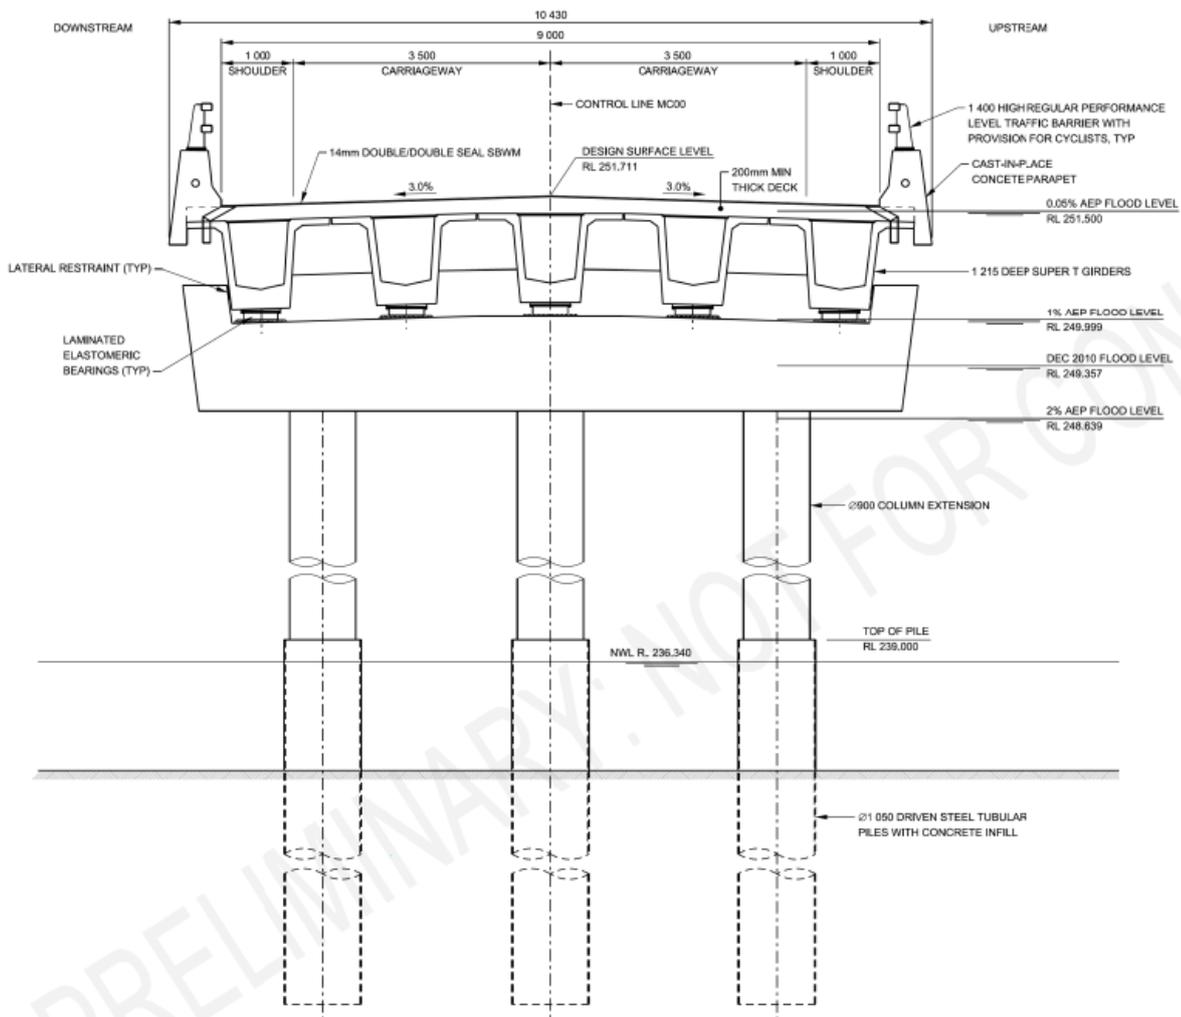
Typical cross section of the new bridge design (Concept design)
